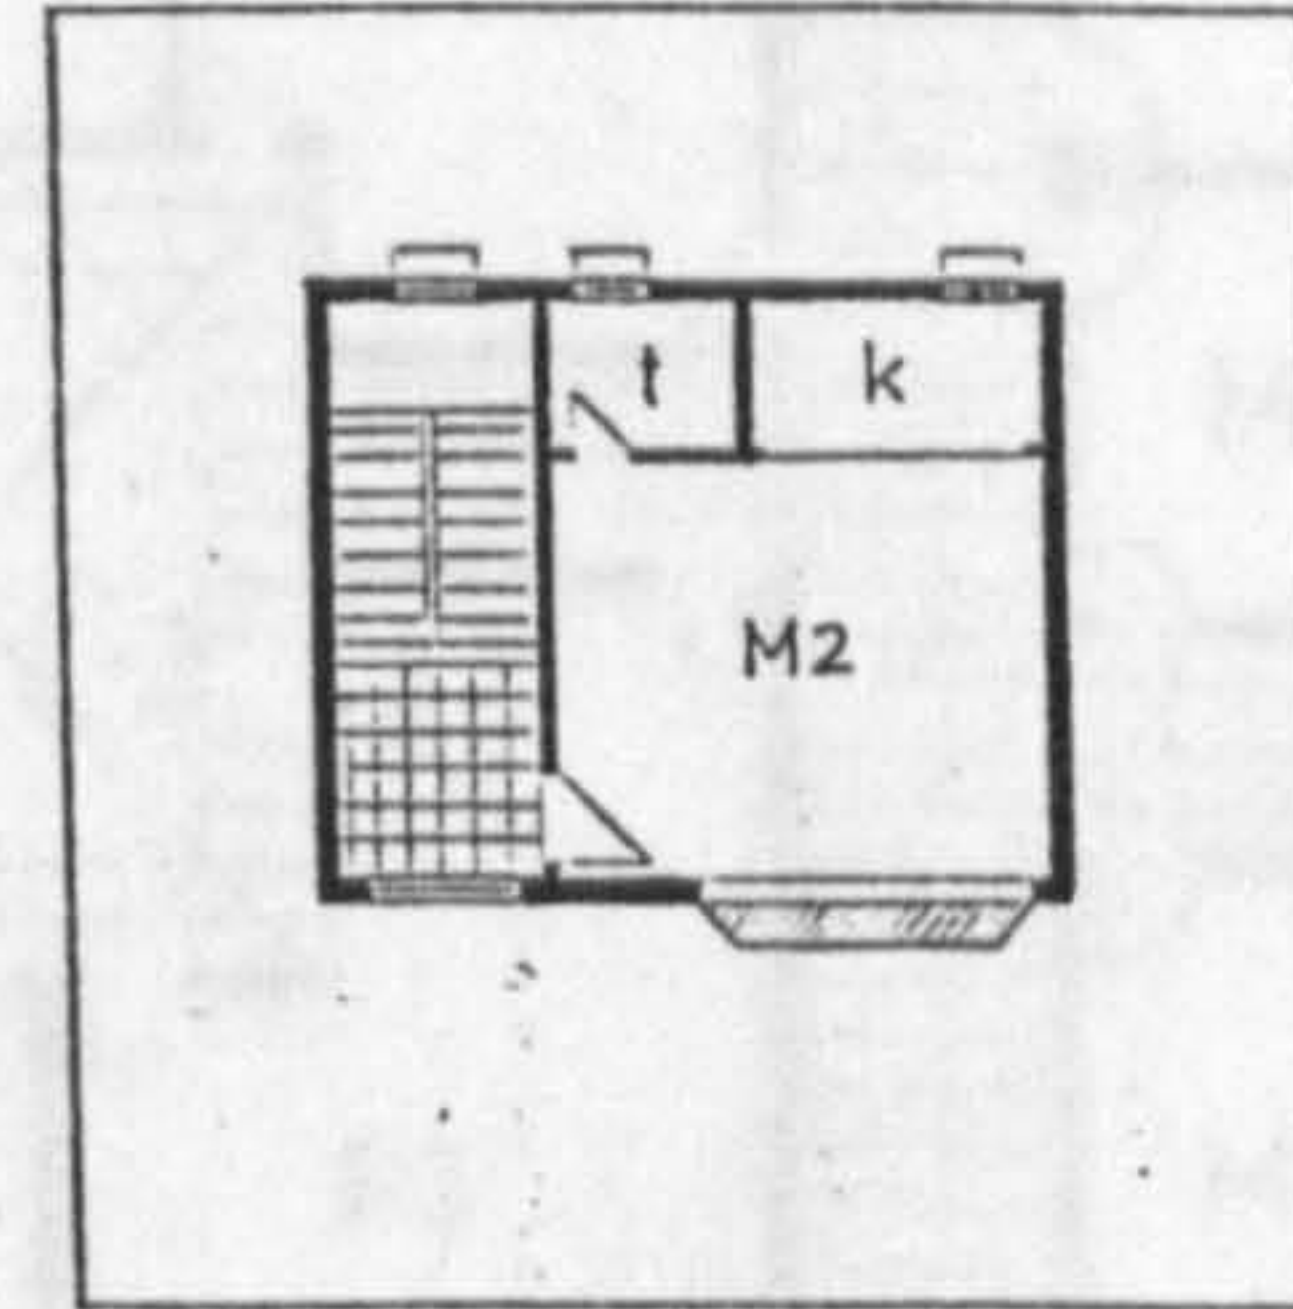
SPATIAL ARRANGEMENT OF HOUSE (5)
